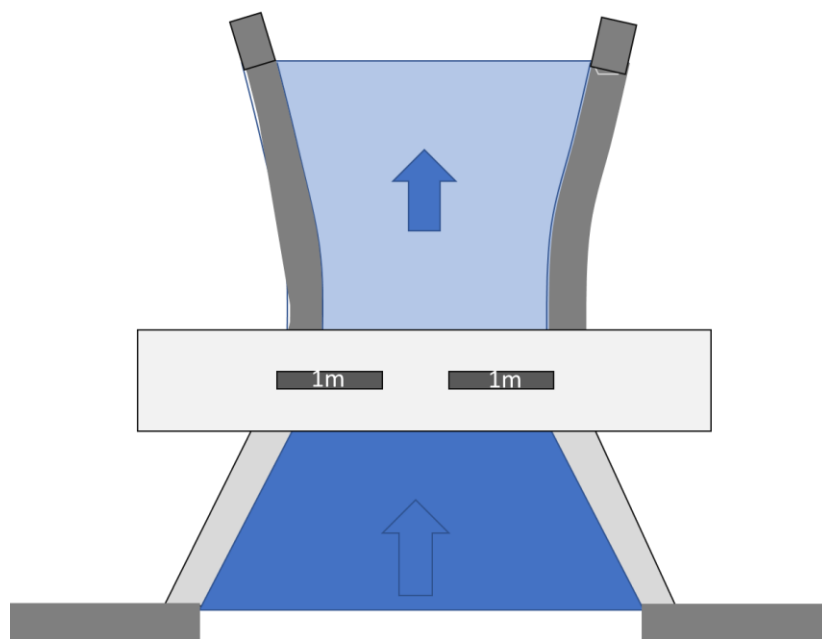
“Concrete lining in dark grey needs repair for Gate 2”
